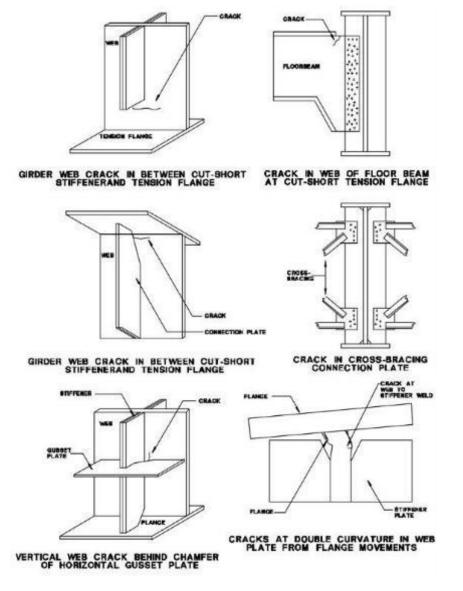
(a) Common locations susceptible to cracking
